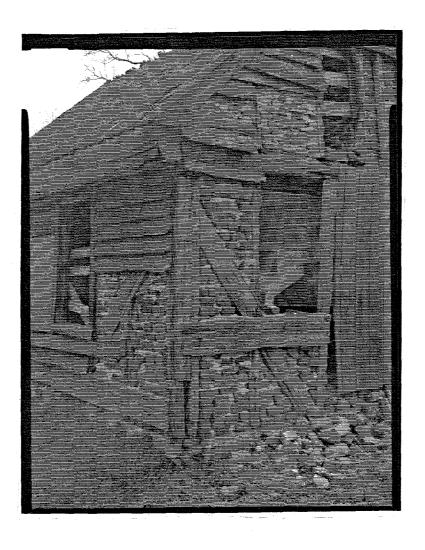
Hermitage Quarter, perspective detail of southwest corner looking northeast.
